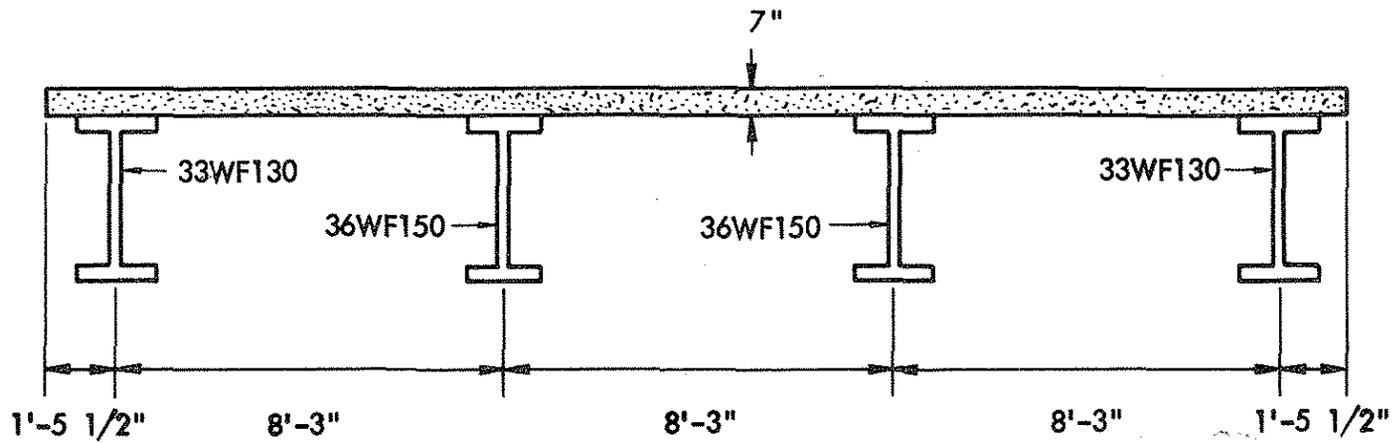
Assumed average cross section - Iowa 89 Bridge.
